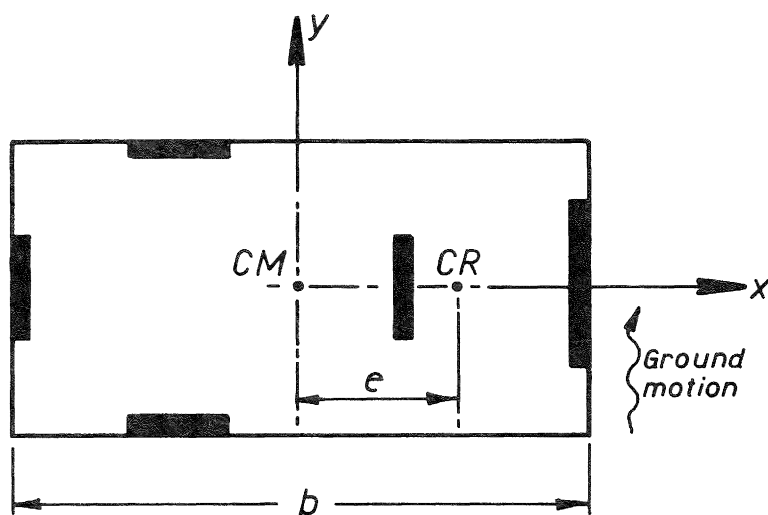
PLAN OF SINGLE STOREY STRUCTURAL MODEL
